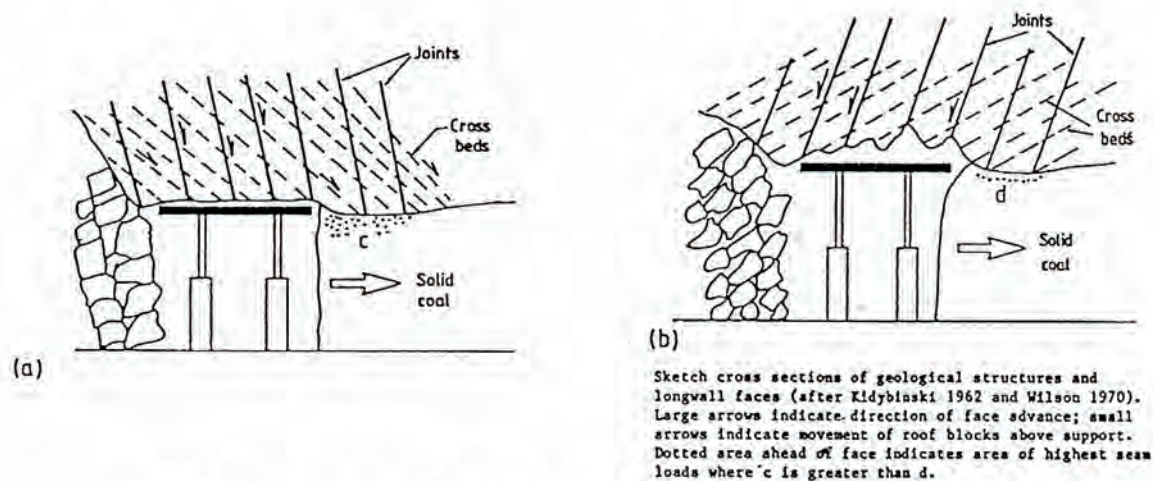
ROLE OF ROOF STRUCTURE ON LONGWALL FACE BEHAVIOUR
